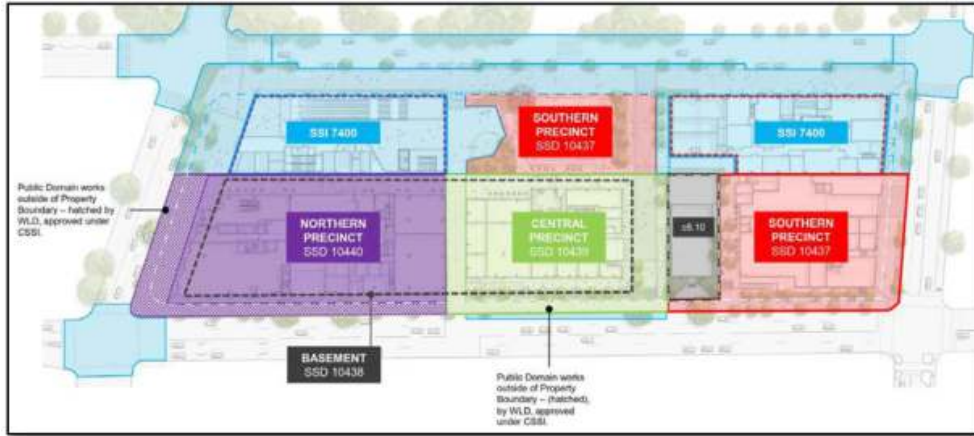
Plan of Waterloo Metro Quarter Precincts (Source: SSD 10437 EIS)
